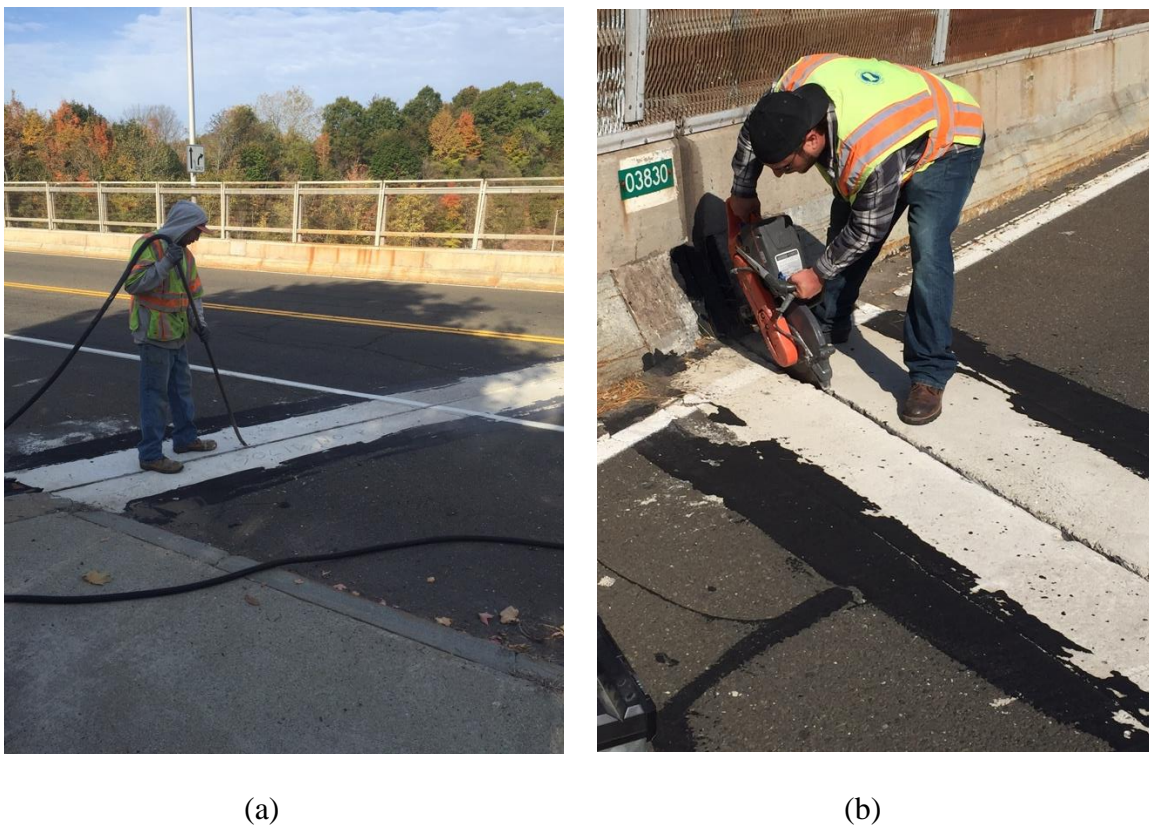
Air blasting the joint (a) and cutting of the header surface (b)
